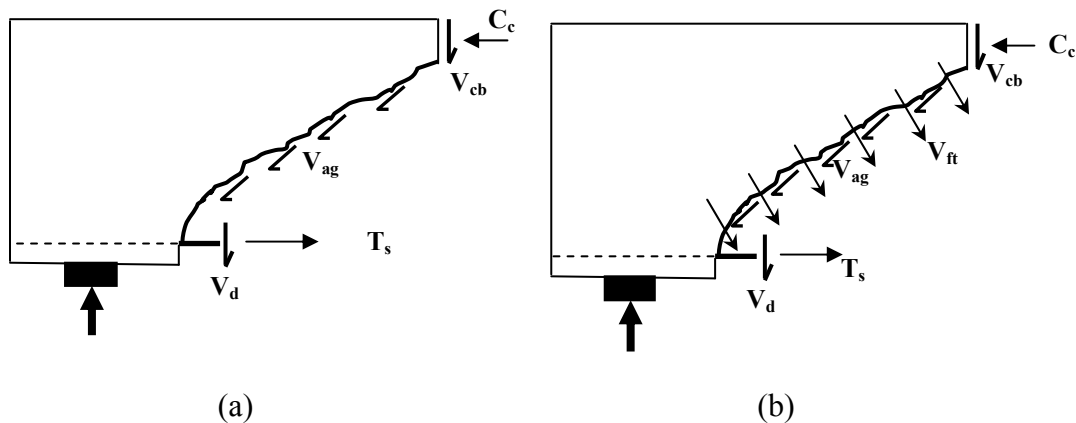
The shear force components across a flexural-shear crack in a) RC members without stirrups b) SFRC members without stirrups
